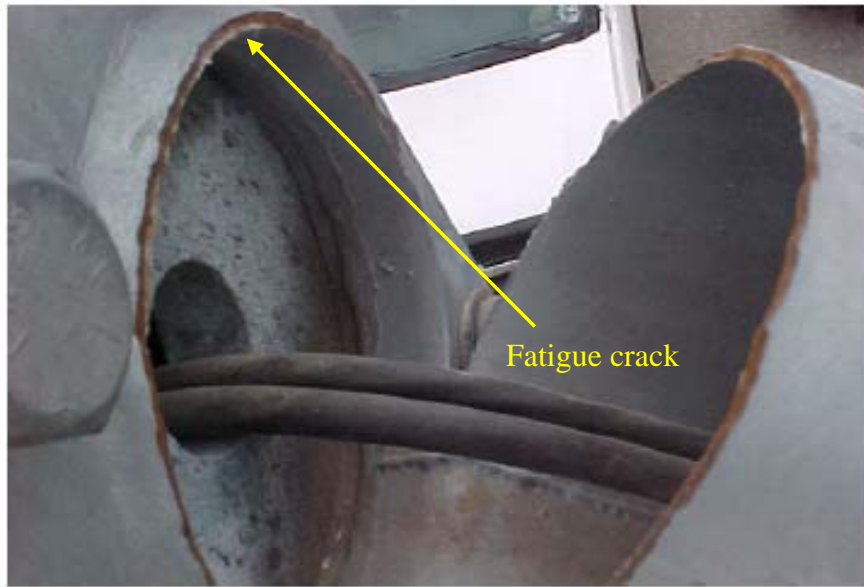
Failure due to fatigue crack initiated at top of mast arm [11]
